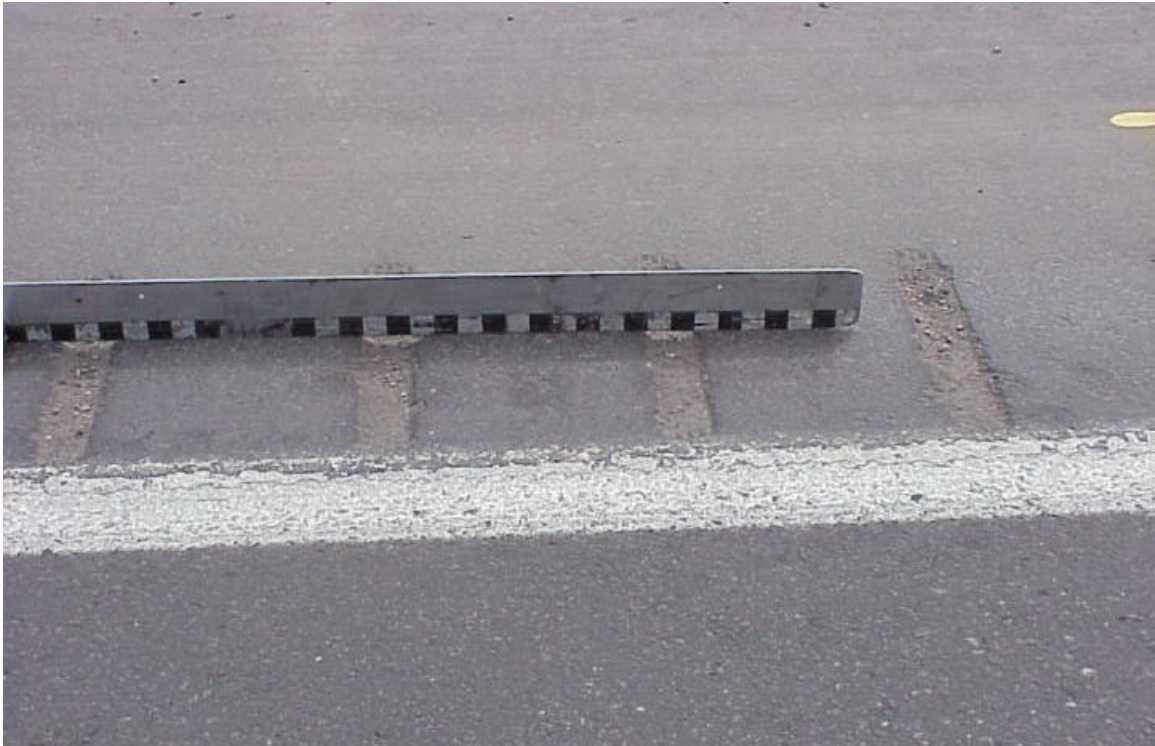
Test section 1 on I 70 at Eagle - 2" groove 10" flat. This is one of the new two-inch-groove style rumble strips. Bicyclists liked it but it didn't generate loud enough sound in a motor vehicle.
